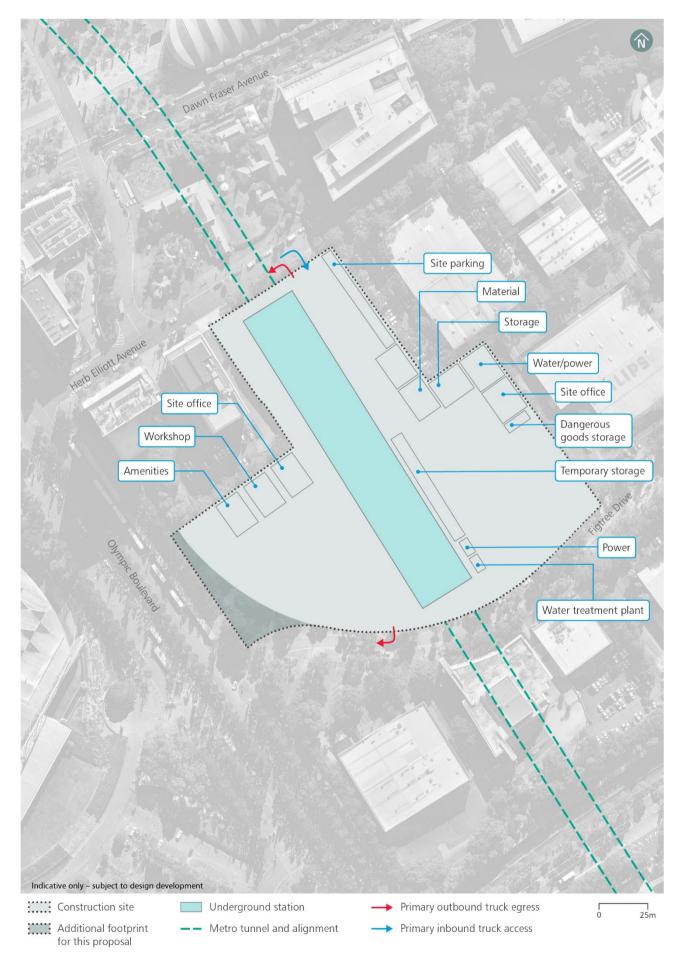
Indicative construction site layout – Sydney Olympic Park metro station
